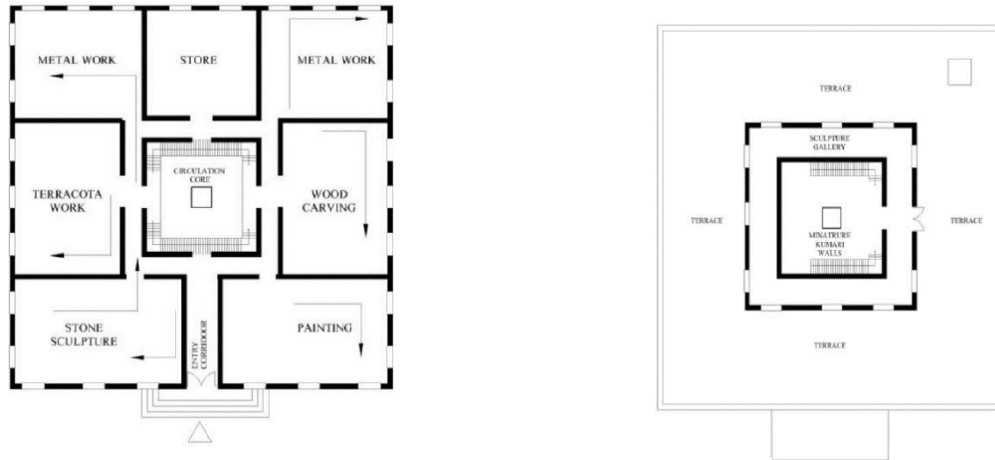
Floor plans of Juddha Jatiya Kalashala
